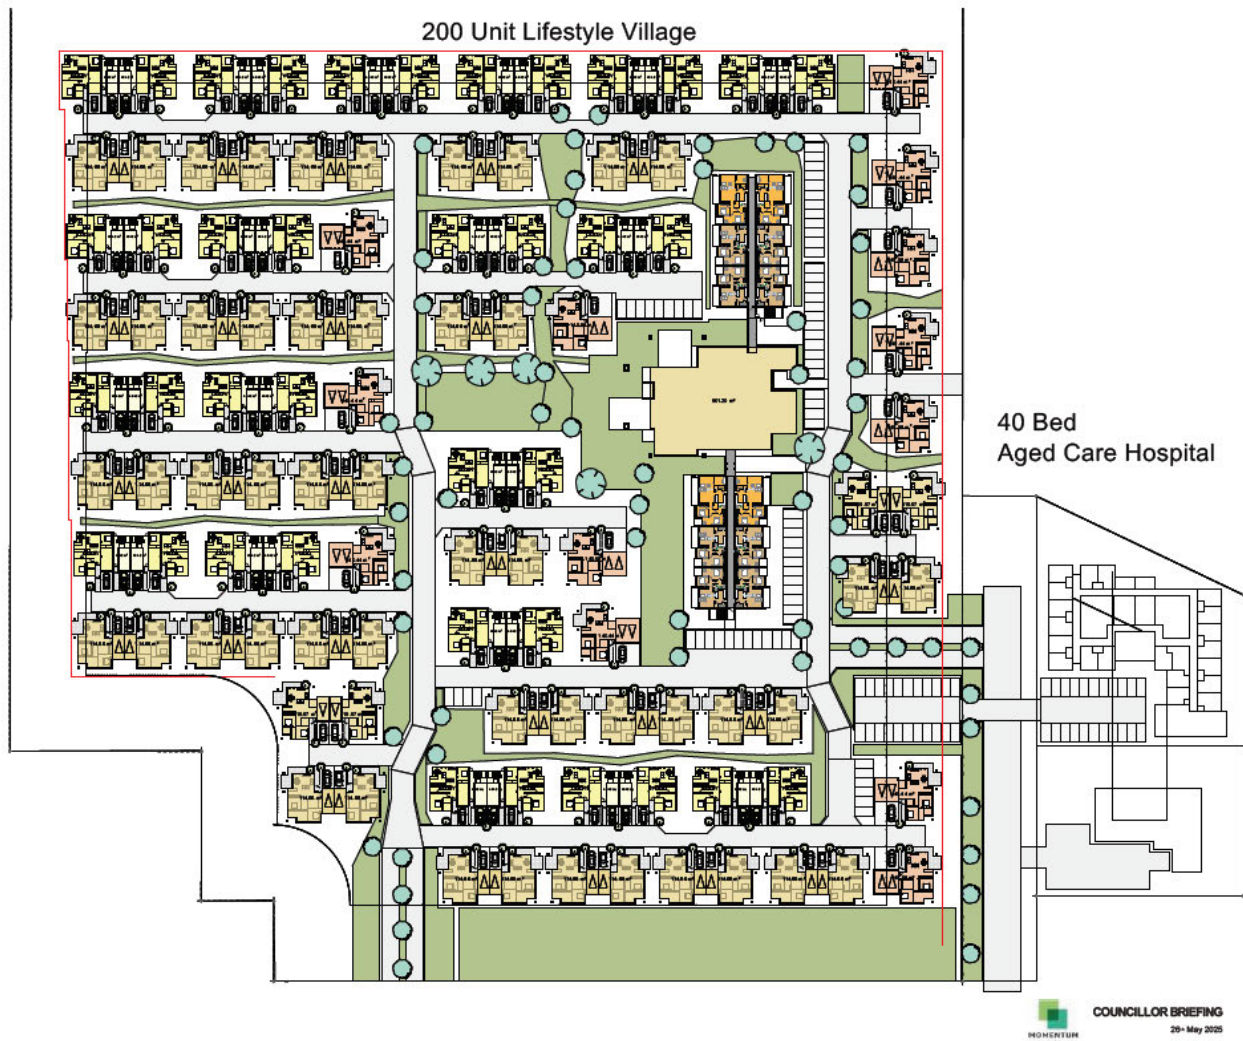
Indicative Site Development Layout for South Block (Retirement Village, 310 Beach Road) as part of Referral Application, and for Aged Care Hospital on 302 Beach Road (subject to separate resource consent process outside of the fast-track approvals process)
